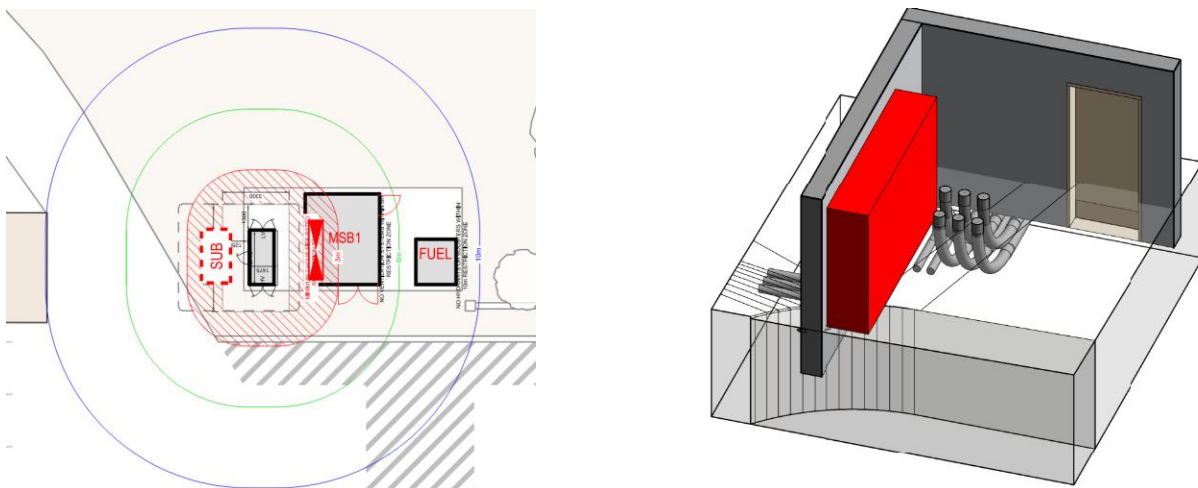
Proposed location of Main Switchboard Room (and 3D detail), Kiosk Substation and Fuel Bulk Tank layout.
